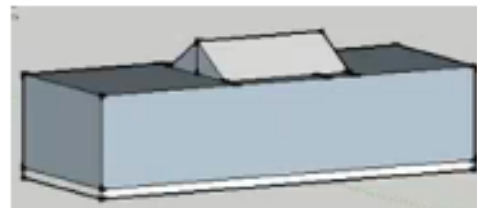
Cathedral ceiling configuration with no step wall, typical with pitched roofs.
